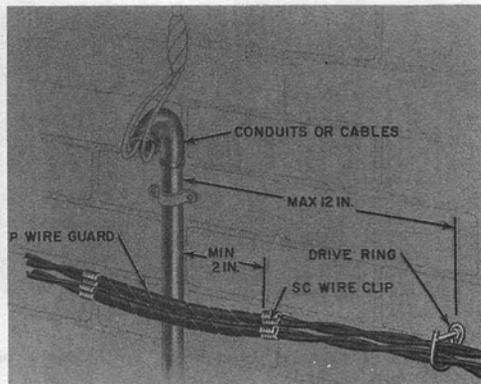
Wires Crossing Cables, Conduits, Signal, or Ground Wires on Masonry or Brick Surfaces
